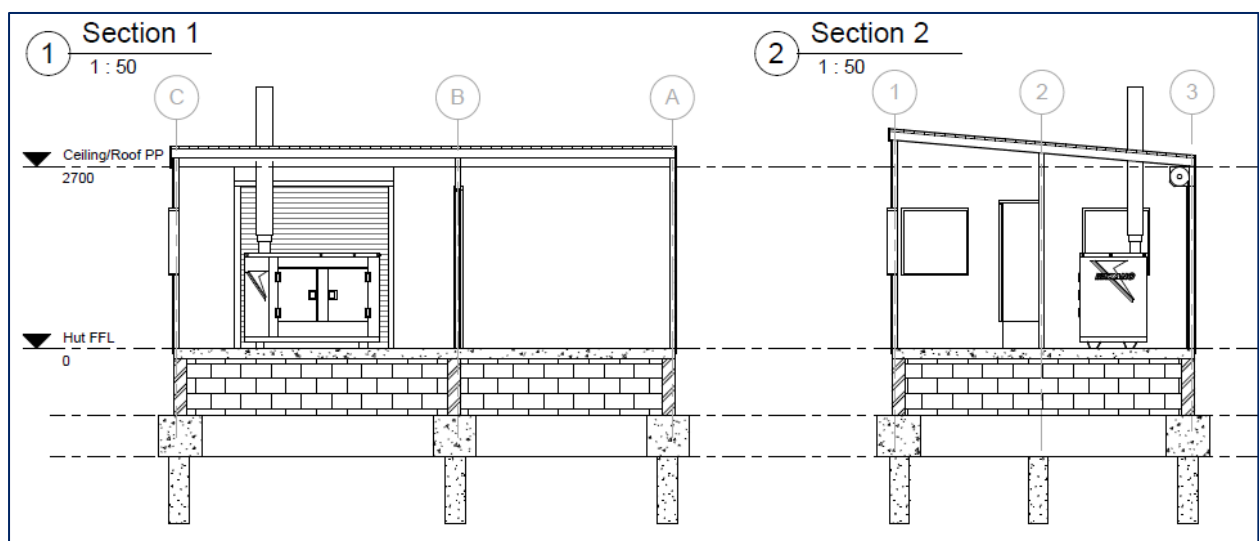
| Section plan of proposed hut (Source: Applicant's documentation)
